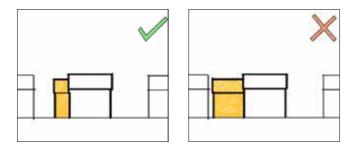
How to ensure that extensions reflect the patterns of spacings between dwellings
